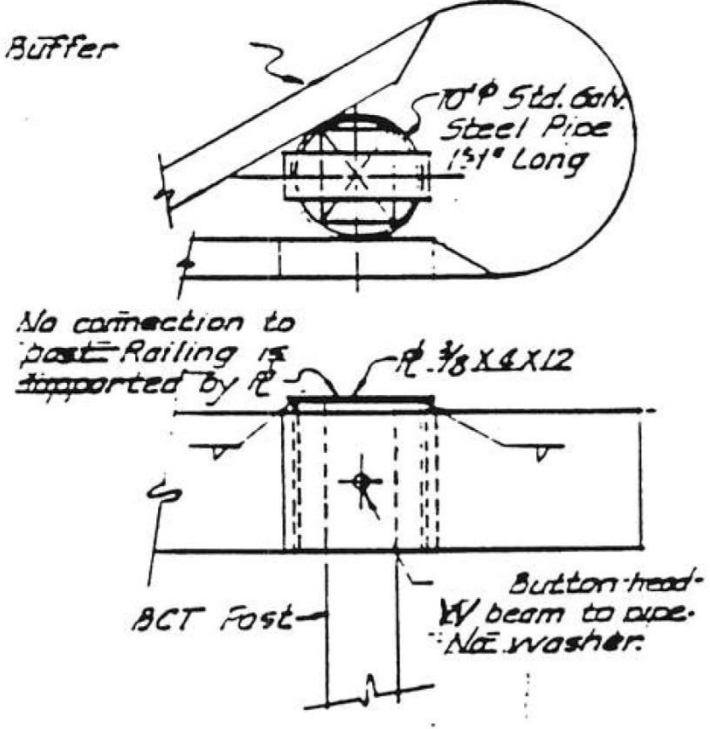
End Terminal Details, Yuma County Short Radius Guardrail System [6]
